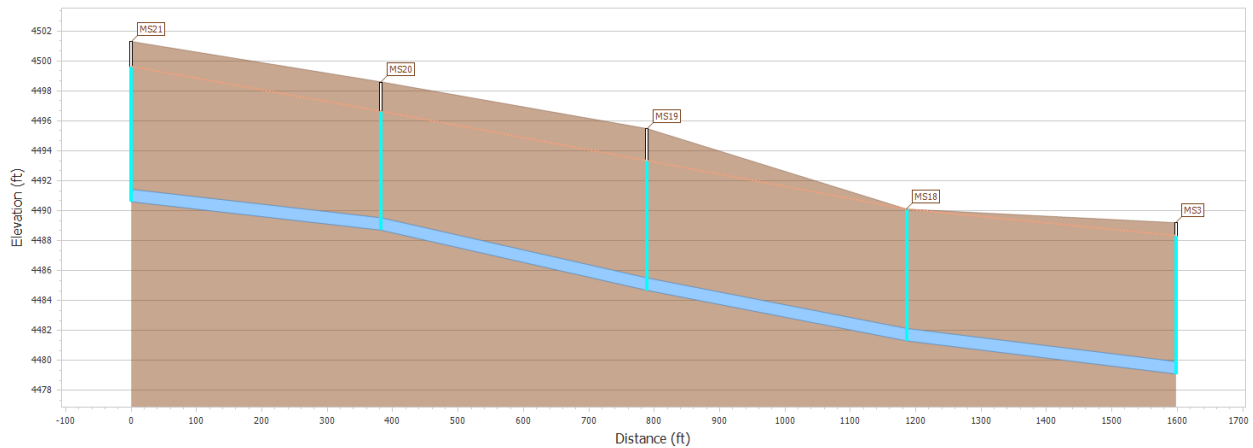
S 800 W Trunk – Master Plan HGL
